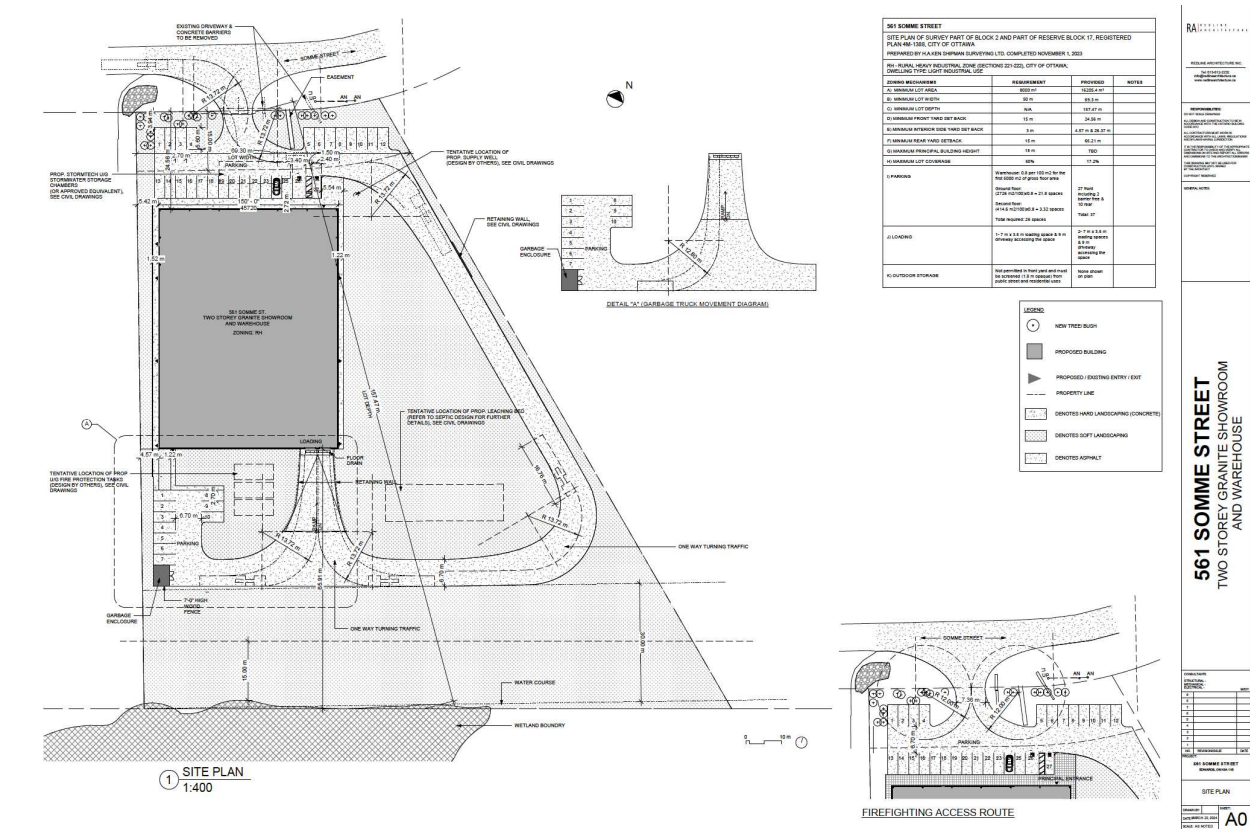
Extract of Site Plan (Source: Redline Architecture)
